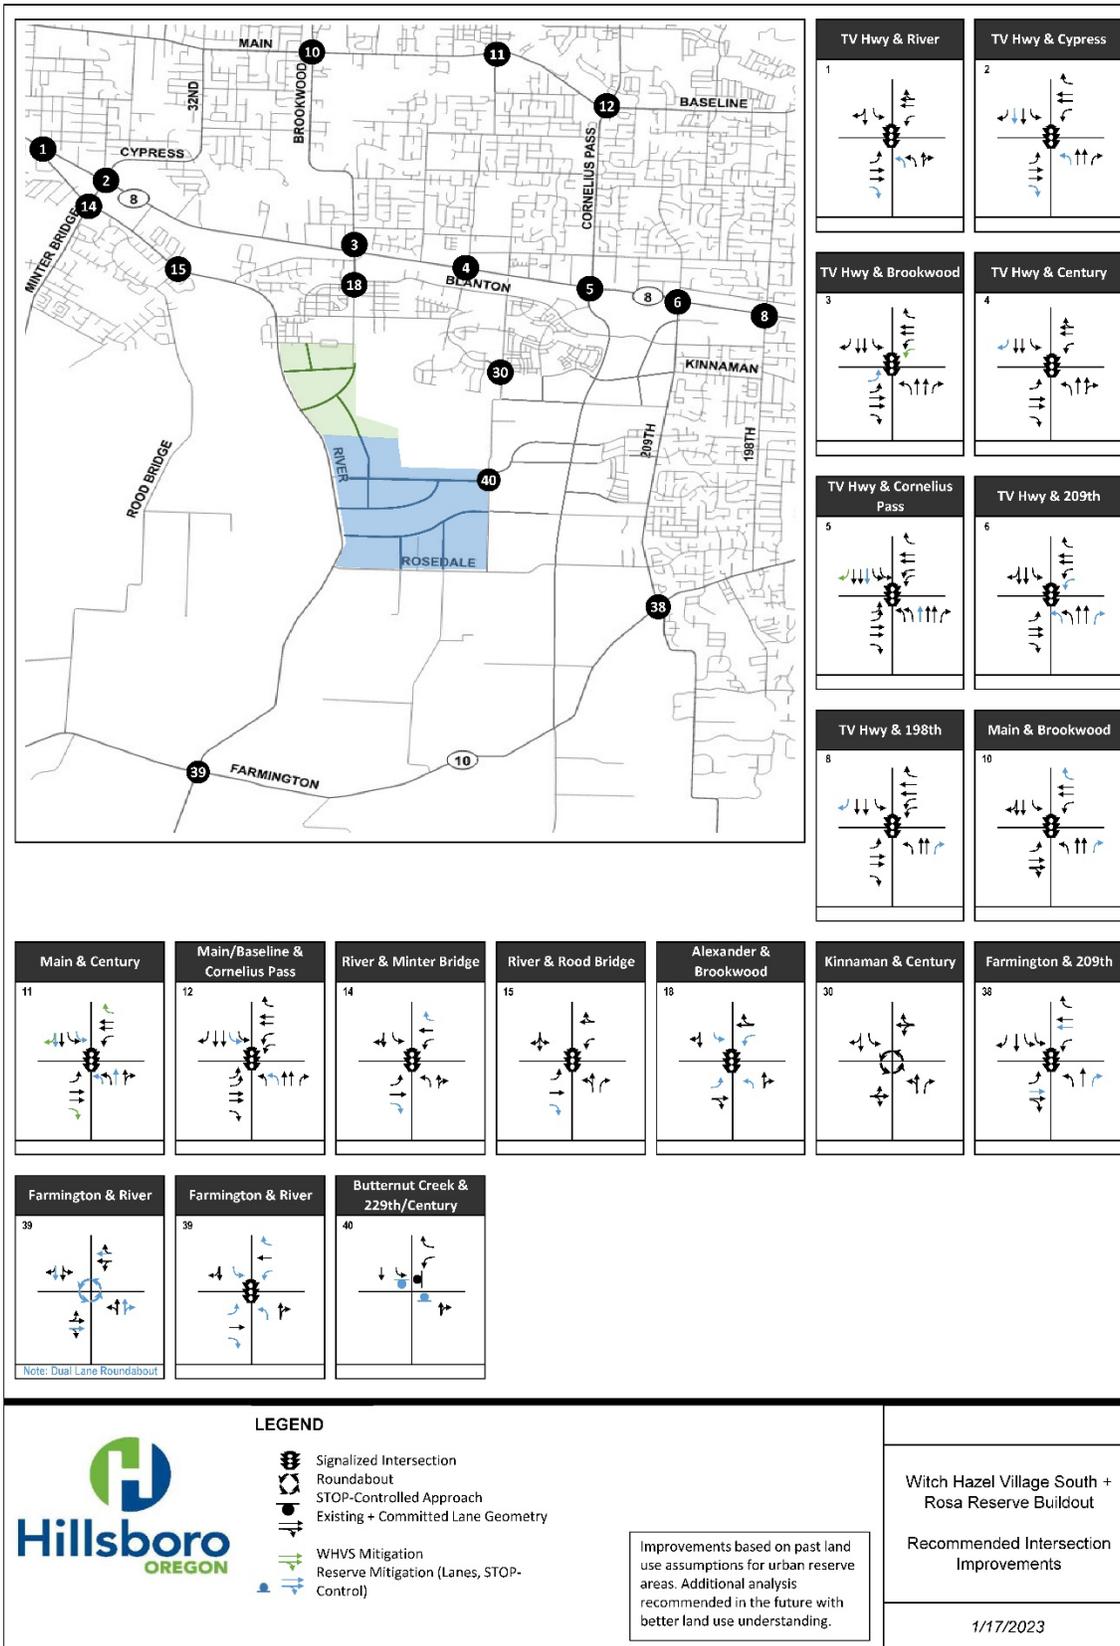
D: WHVS & Rosa Reserve Buildout Recommended Intersection Improvements
